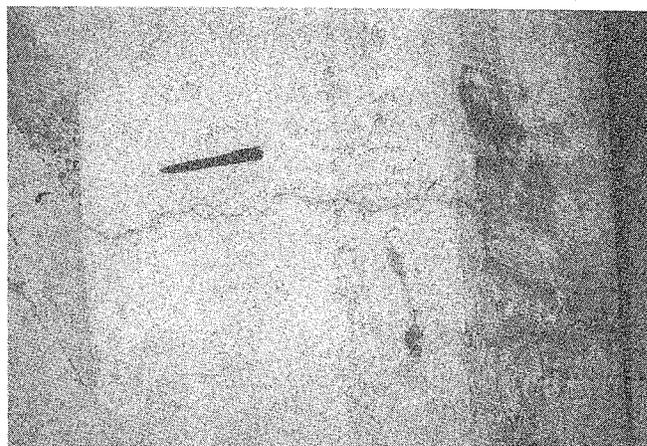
Crack in concrete rib cap at Kahului West
